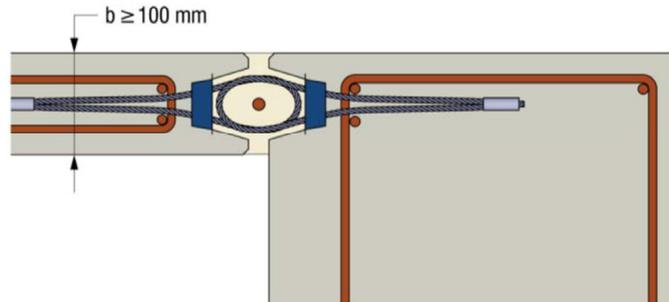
Wall – Wall – Corner connection - standard detail (*recessed installation*)
